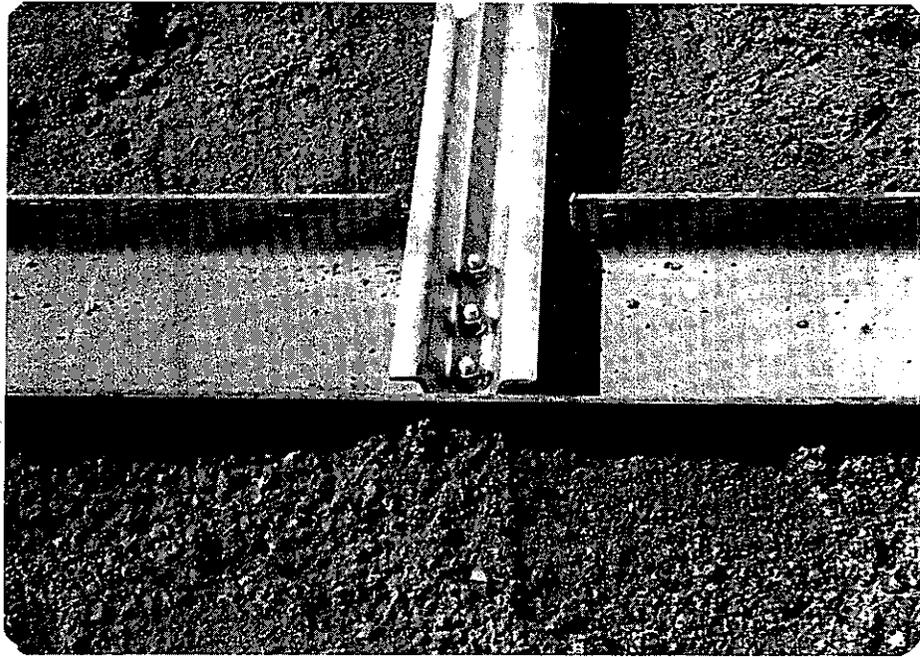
Sign Post Tieback Attached to Rubbing Rail Anchor
